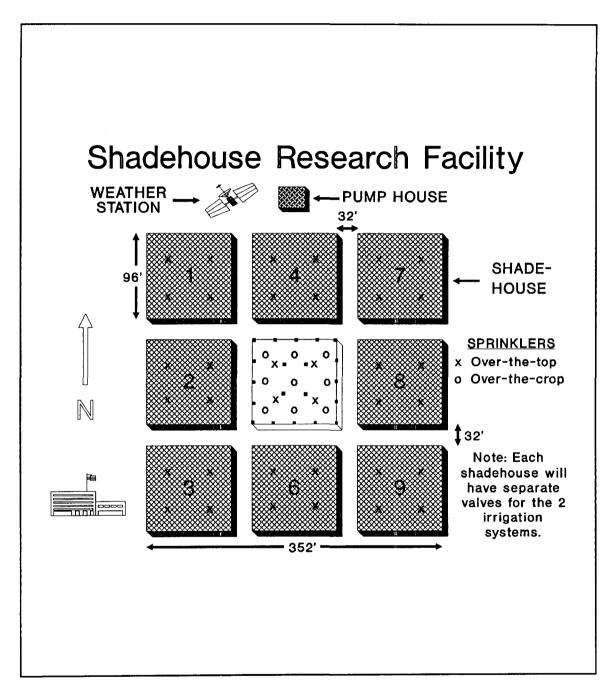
Schematic of shadehouse research facility in Pierson, Florida. Note that the shade fabric has been removed from the center shadehouse to reveal the layout of the over-the-crop irrigation systems. Each shadehouse was equipped with both over-the-shadehouse (over-the-top) and over-the-crop irrigation systems.
